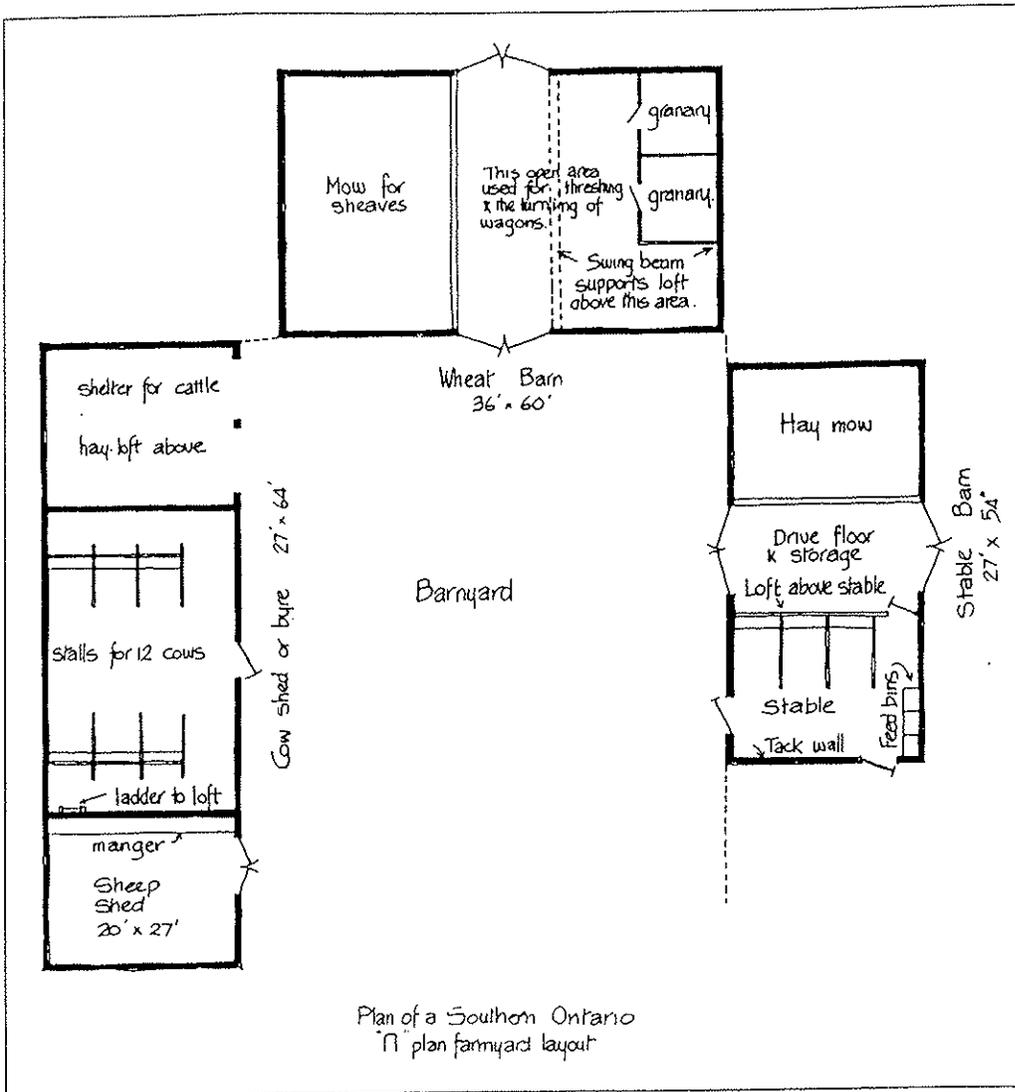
Plan of Mid-Nineteenth Century U-Plan Farmyard Layout.
